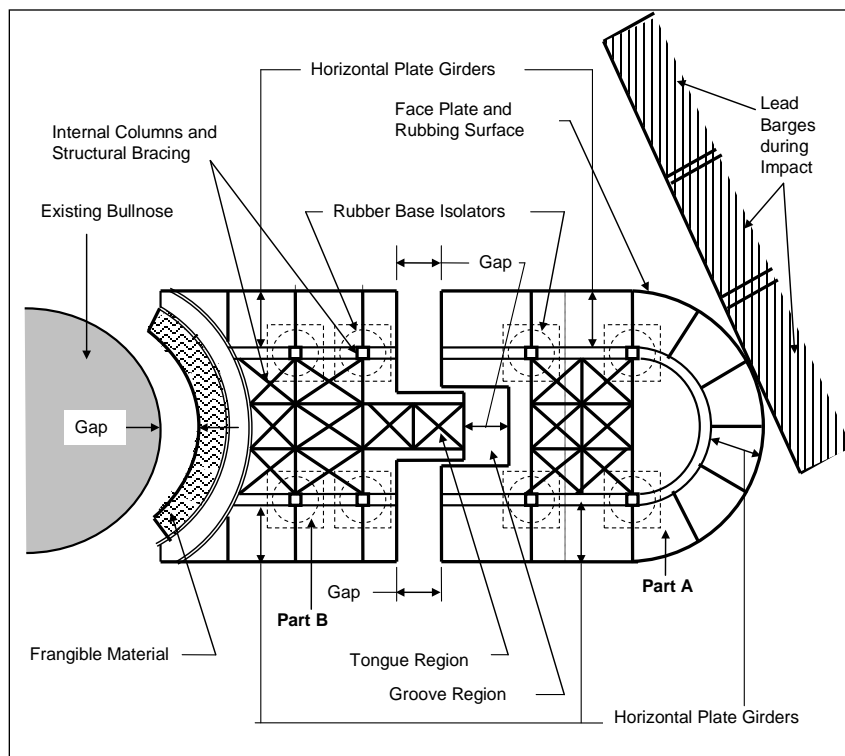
A multi-part tongue-and-groove impact nosing.
